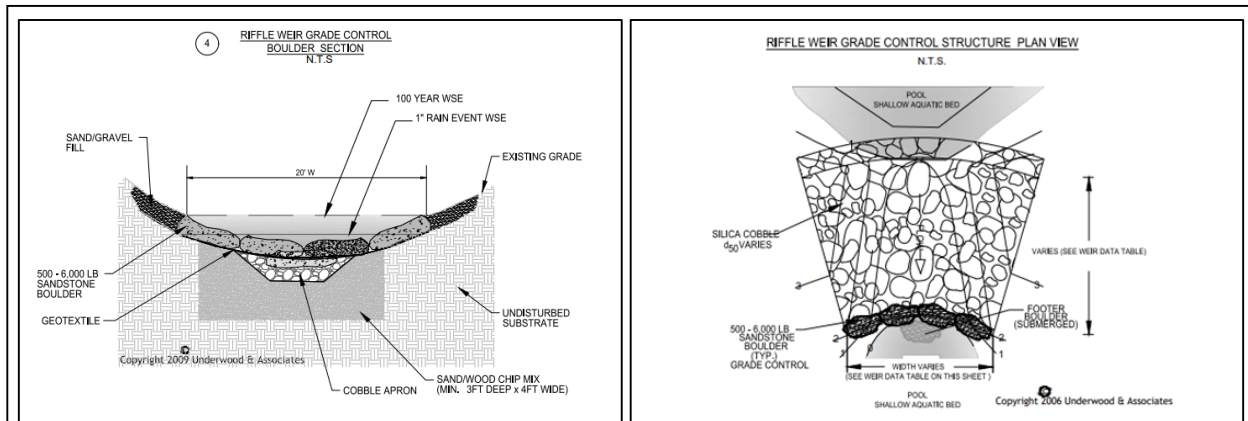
Sample plan view and cross sections of one-foot riffle-weir. Note that weir boulders are not stacked on top of footers.
